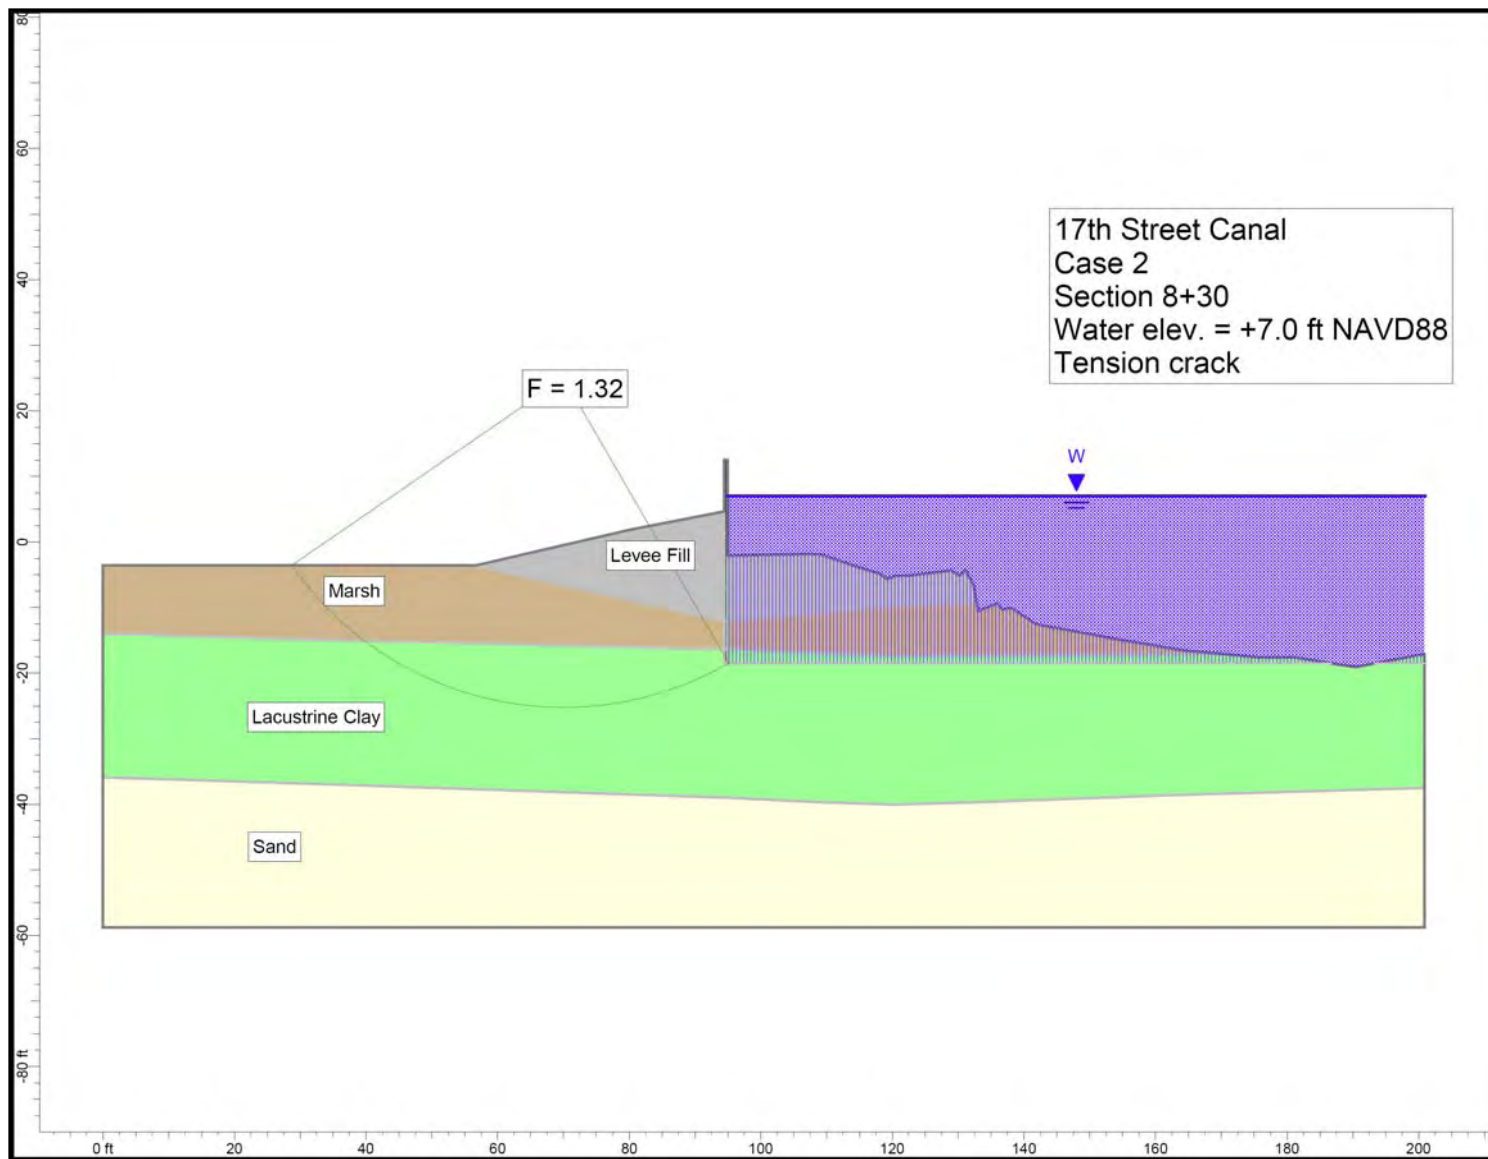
Critical Circle for 17th Street Canal Station 8+30 – Water Elevation 7.0 ft, Tension Crack
